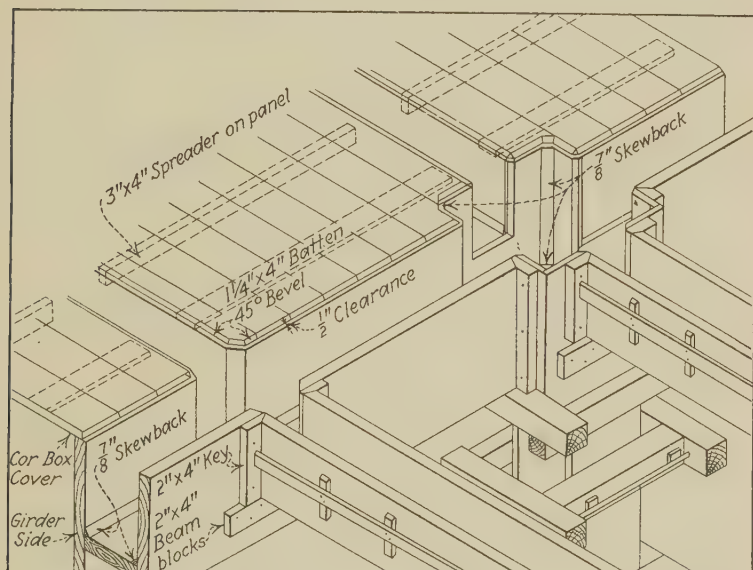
KEY CONSTRUCTION FOR VARIOUS INTERSECTIONS.
